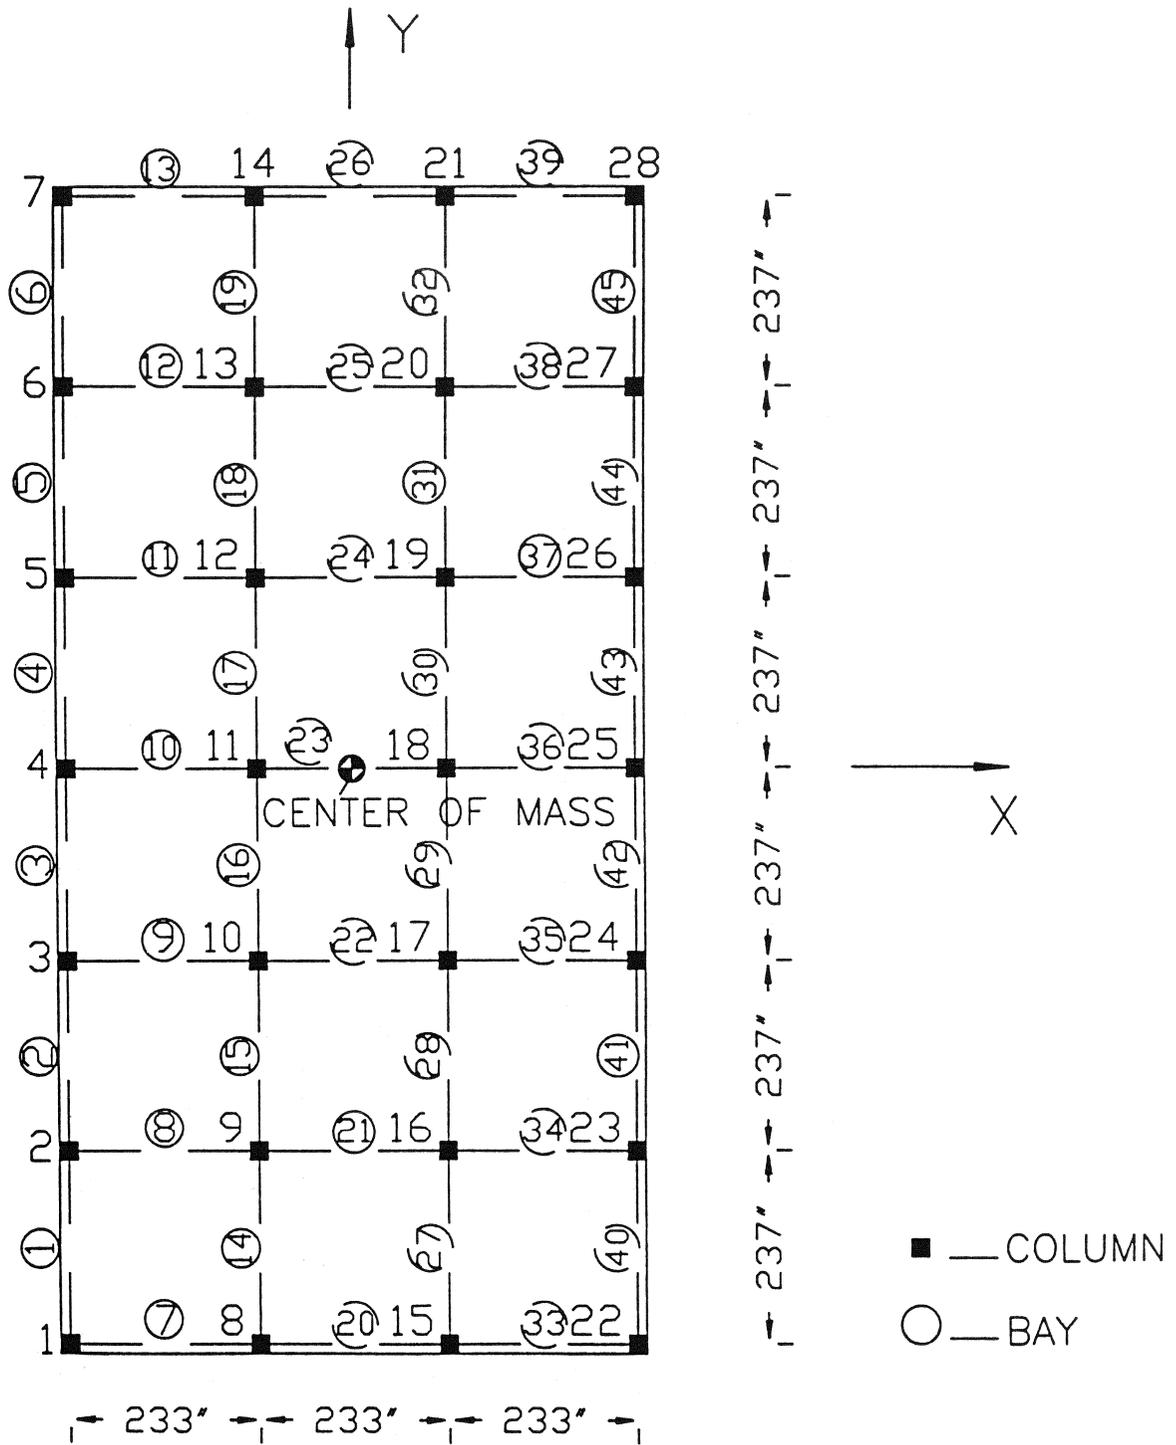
Cross Sectional Plan of the Eight Story Reinforced Concrete Base Isolated Building between Levels 7 and 8. Note the Location of the Column Lines and Bay Numbers (Refer to the Input File given in Appendix D)
